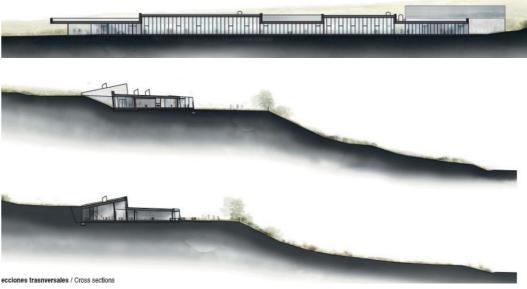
Sections, Sun School, RCR architects (2014) • Source: El Croquis
